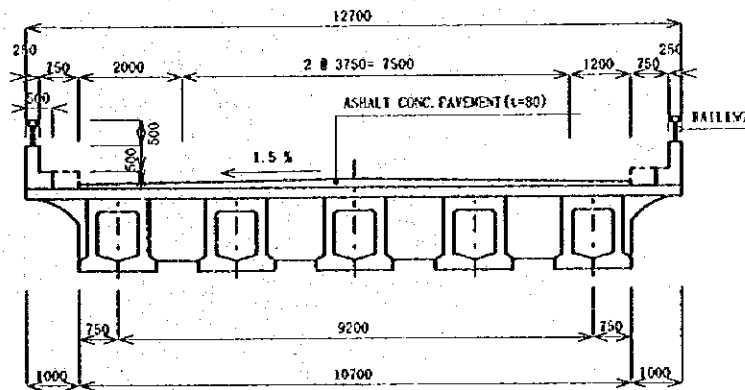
Cross-sectional Details of Super-structure Type 2 Girder
